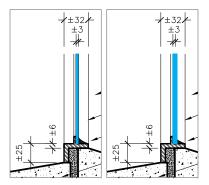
Annotate detail of typical existing window section at sill (left) and proposed window section at sill (right) showing increased thickness of glazing (Drawings by LGA, annotations by ERA, 2017).
